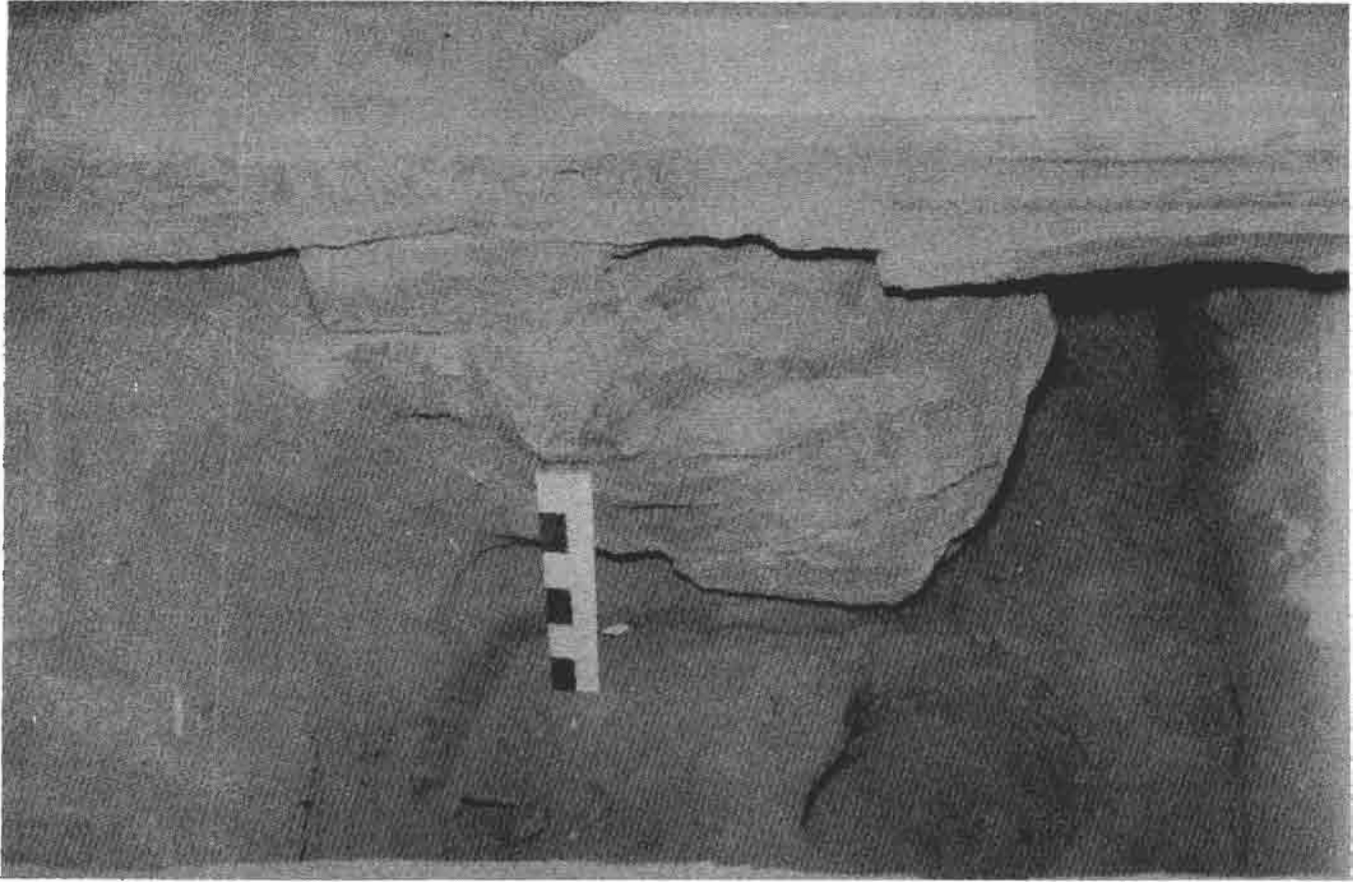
Test pit 1E1E. Note stone and shim supporting floor joist.
